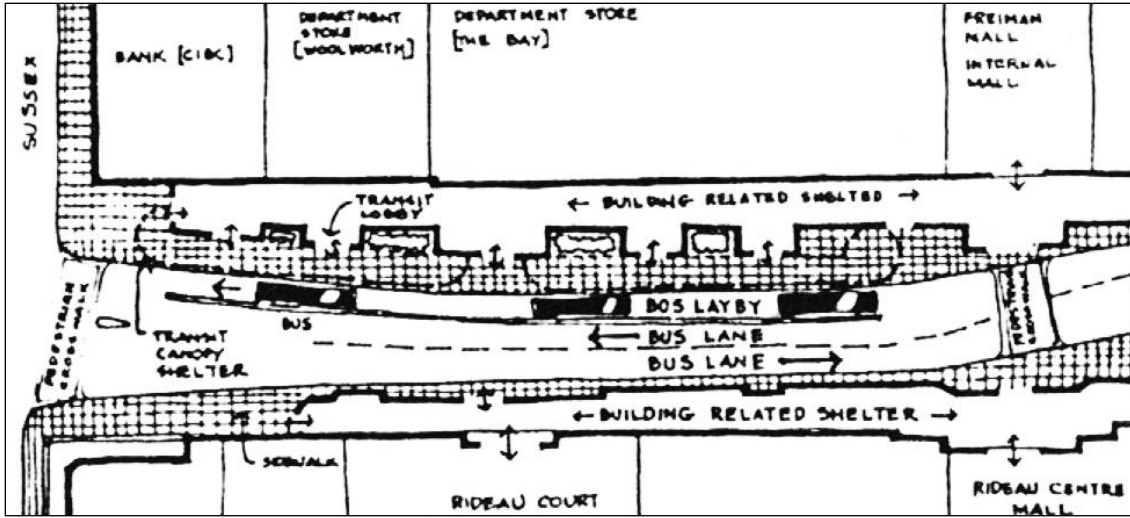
"As Built" plan of the Rideau Transit Mall at Rideau and Sussex St (Chen 1986)
